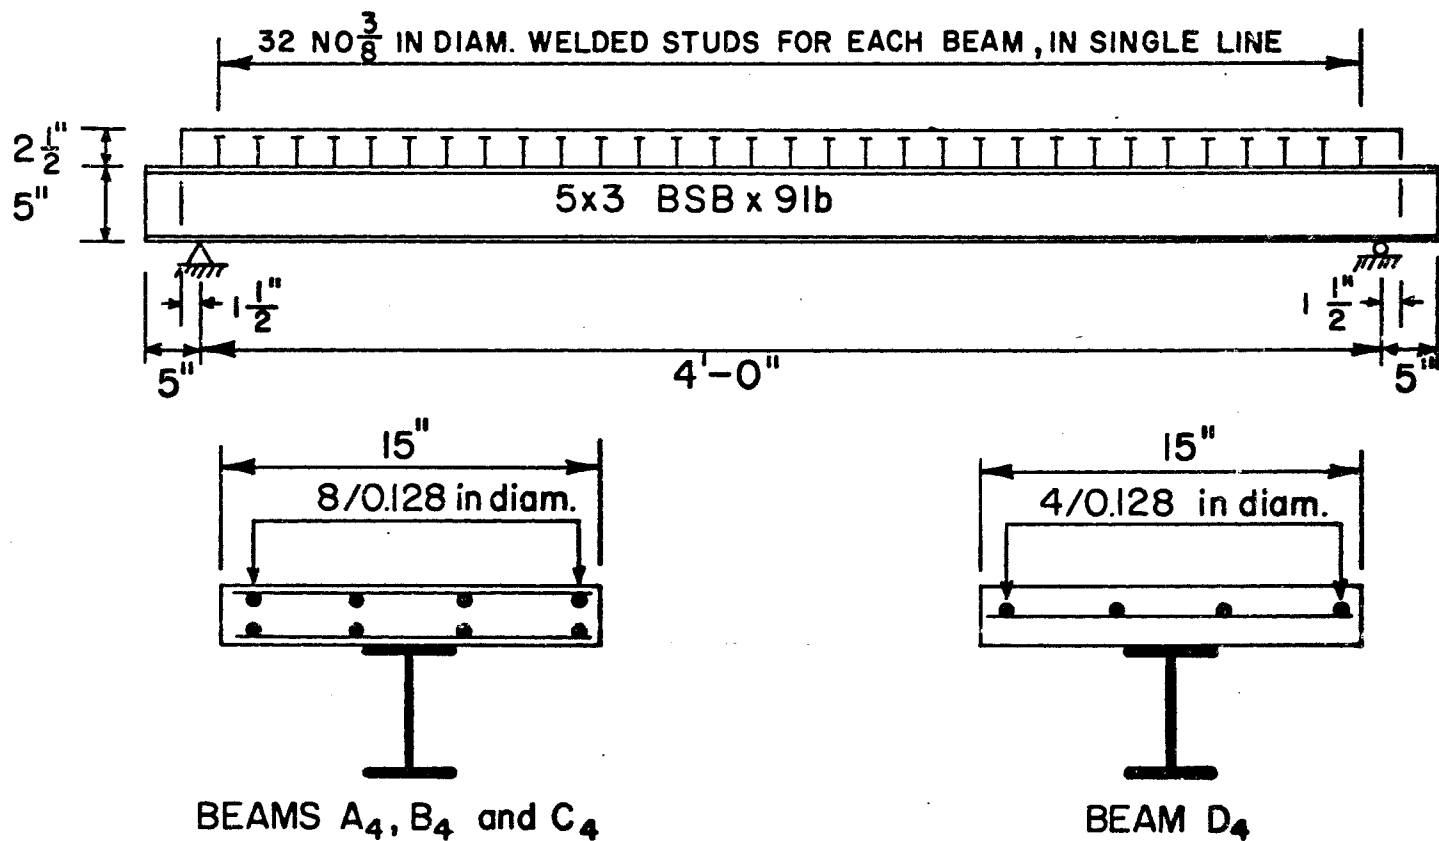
DETAILS OF BEAMS A₄, B₄, C₄ AND D₄
